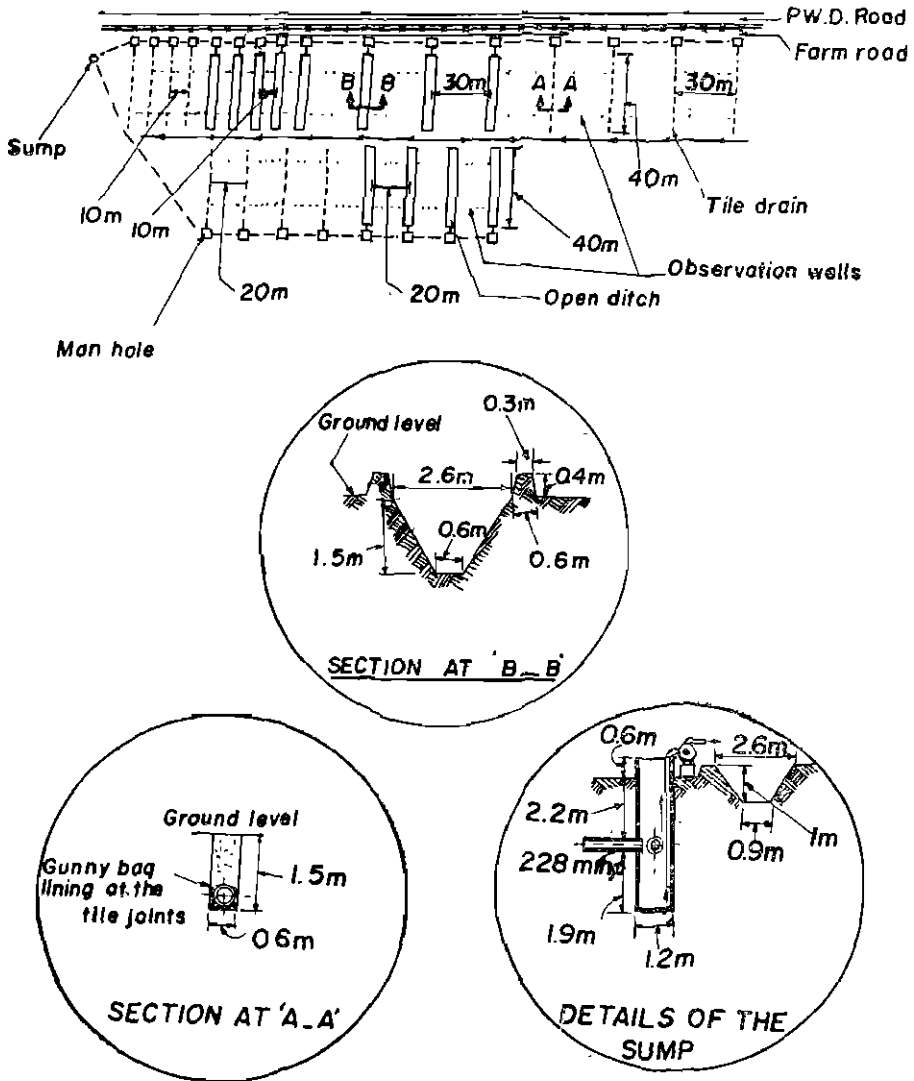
Layout Details of the Subsurface Drainage Experiment on C.S.S.R.I. Research Farm.
